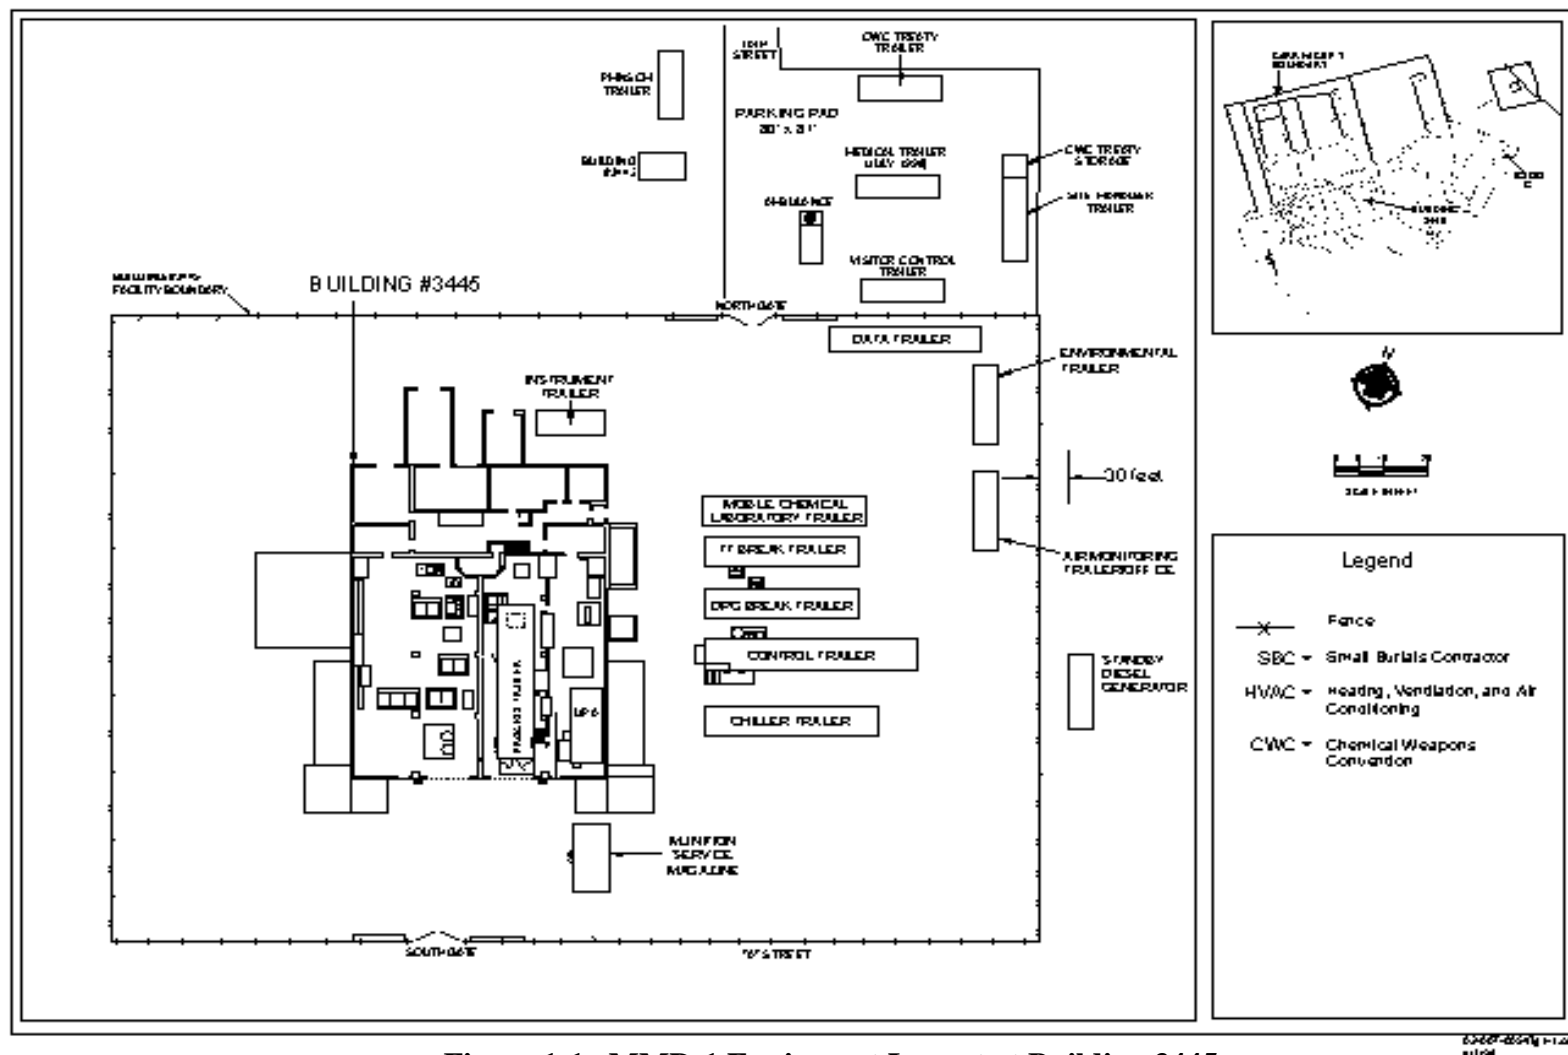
MMD-1 Equipment Layout at Building 3445
